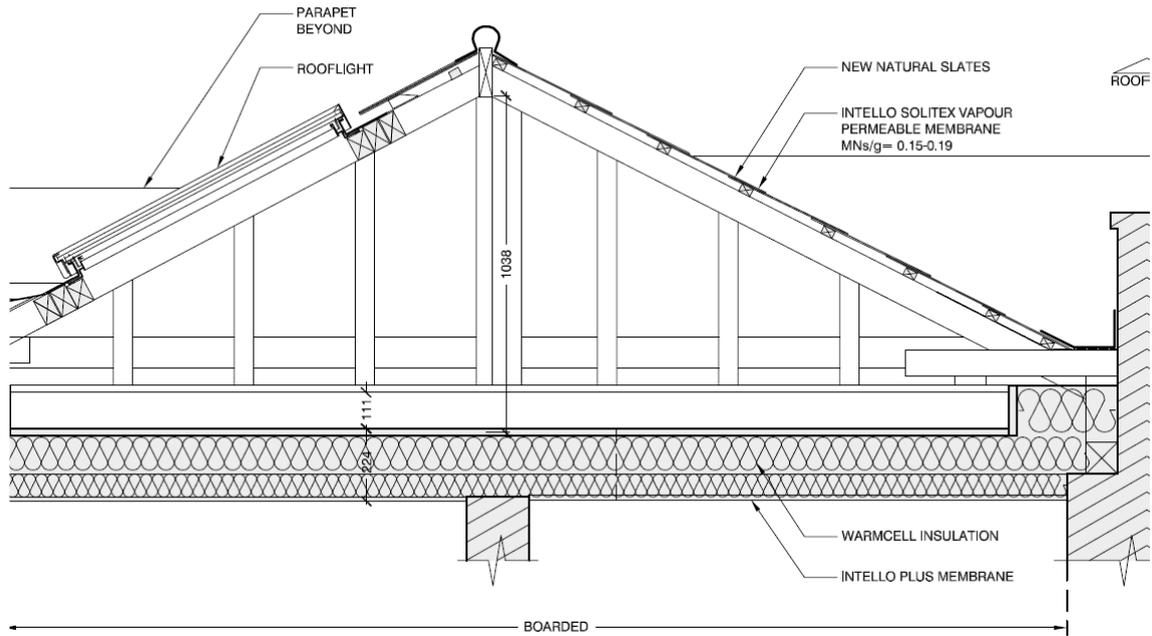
Cross section through attic (Roof 1) (copyright Arboreal Architecture)
